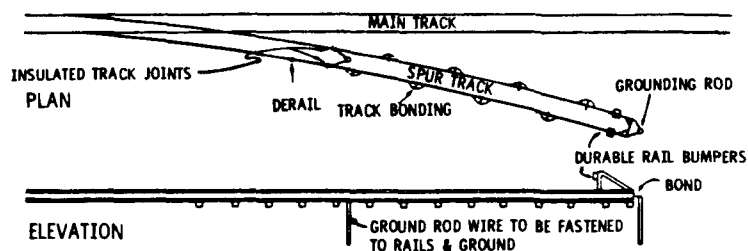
A tank car unloading siding showing rail joint bonding, insulated track joint, detail, and track grounding [5].
